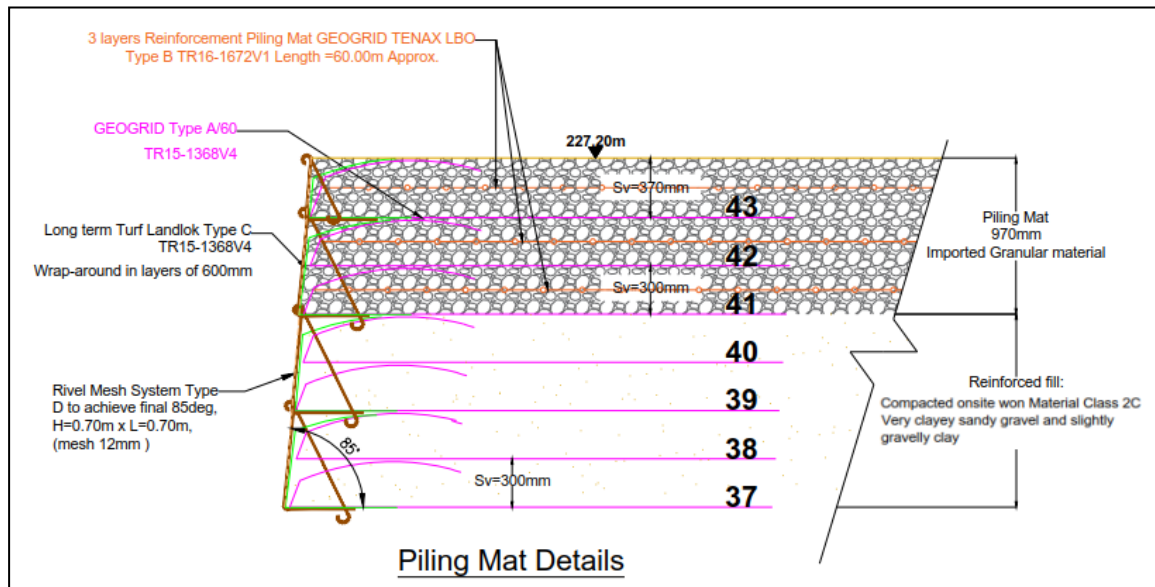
Reinforced Piling mat on top of Reinforced Soil Wall
